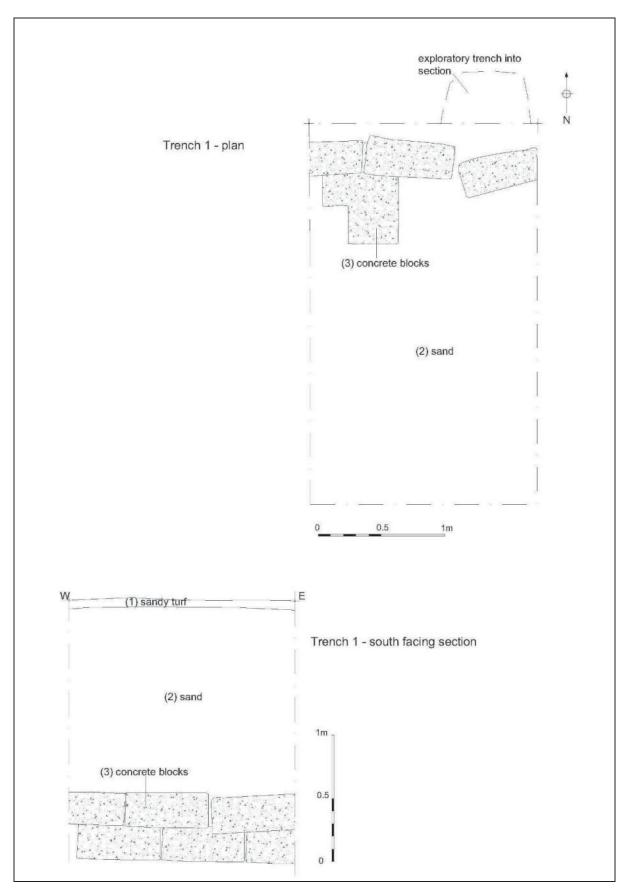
Trench 1 plan and section showing revealed concrete blockwork of oratory 'shell'
